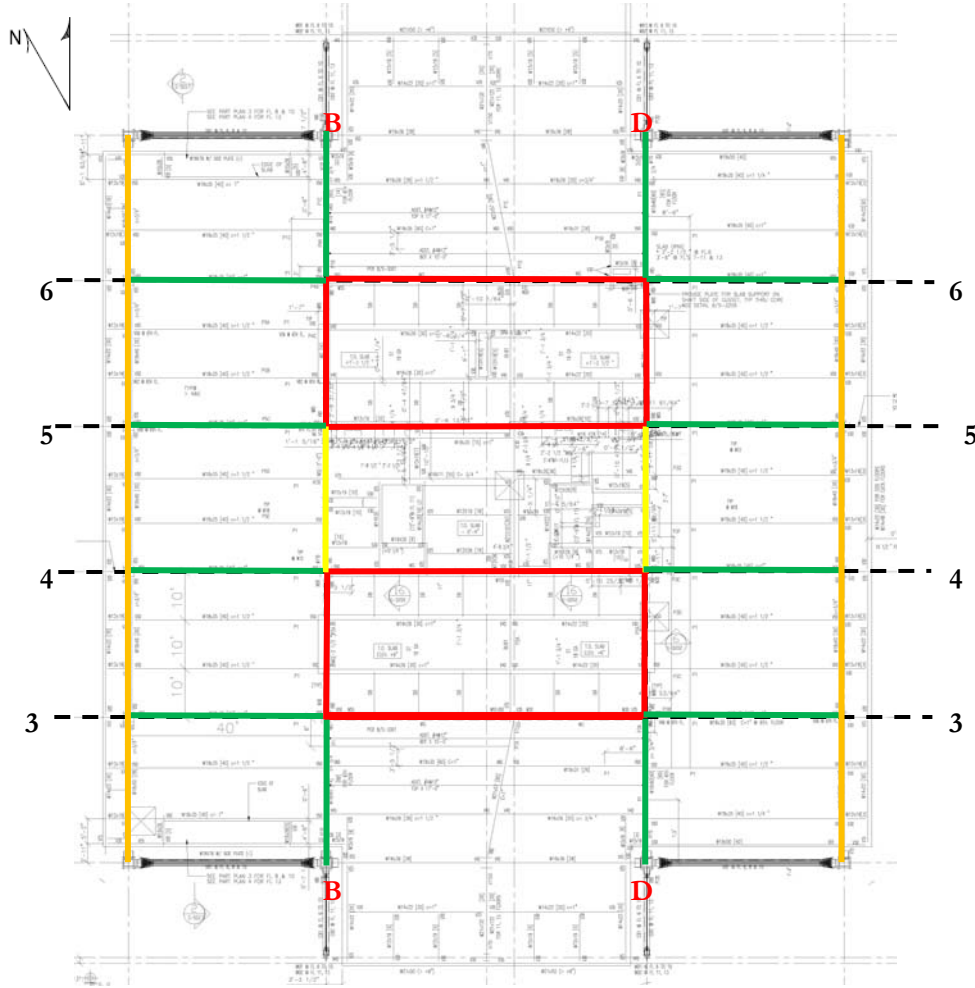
Steel Chevron Bracing with Outriggers & Belt Trusses
